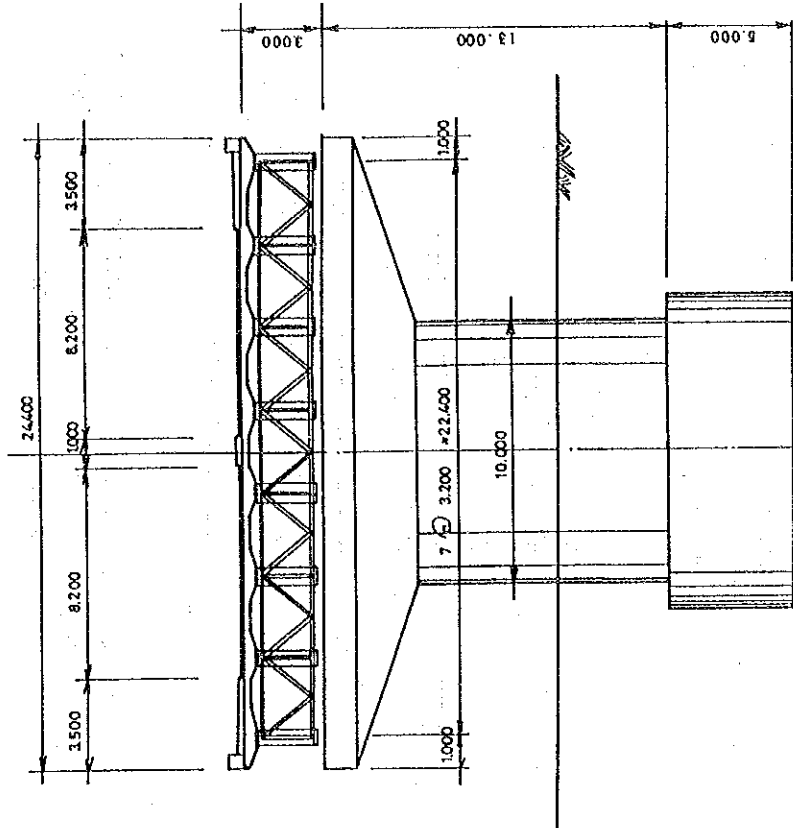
Continuous Steel Plate Girder with Hammerhead Pier on Caisson Foundation
